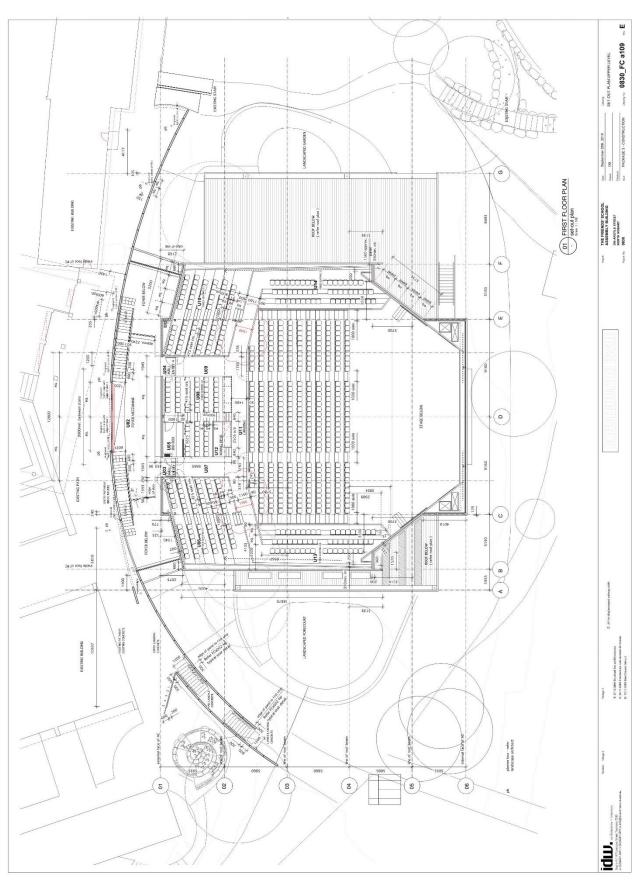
The Farrall Centre – Set-out Plan Upper Level
